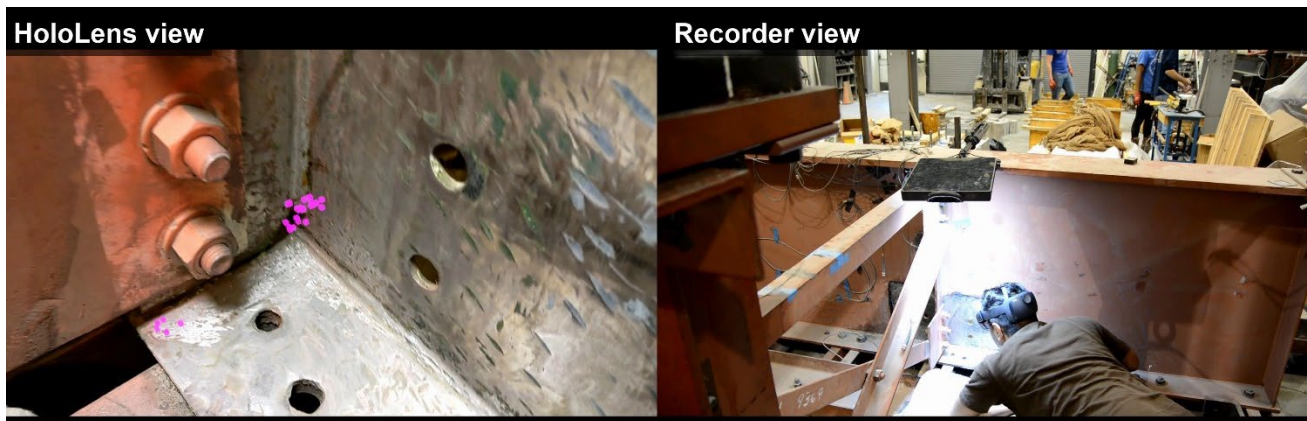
Fatigue crack inspection using developed AR-based tool
